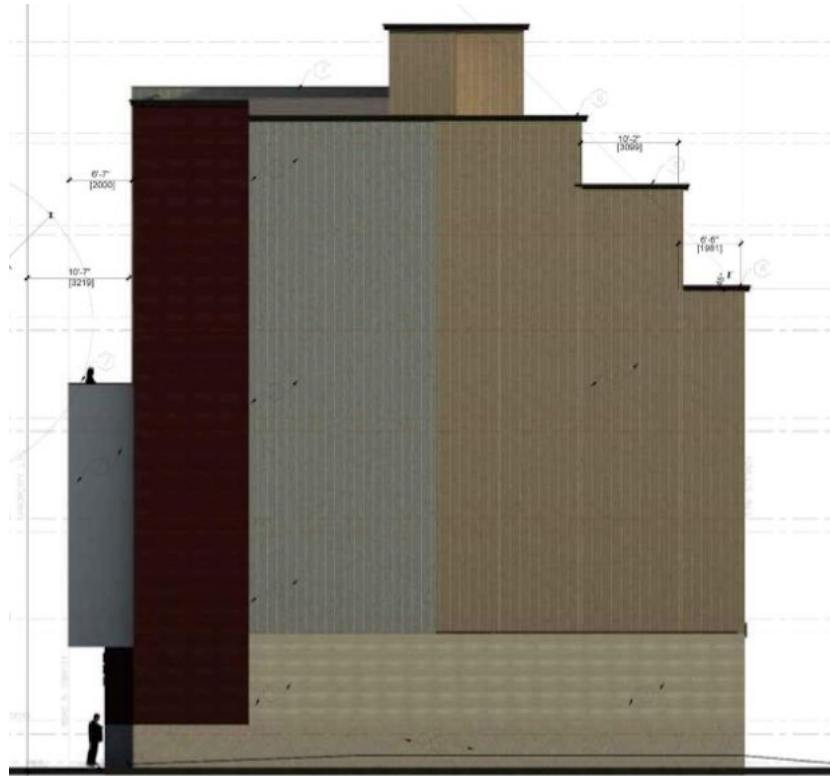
BRONSON AVENUE - INTERIOR ELEVATION (NORTH), SOMA STUDIOS 2018
